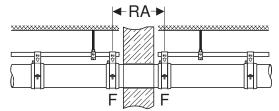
Pipe bracket spacing with a single interruption of the Geberit Pluvia support rail
